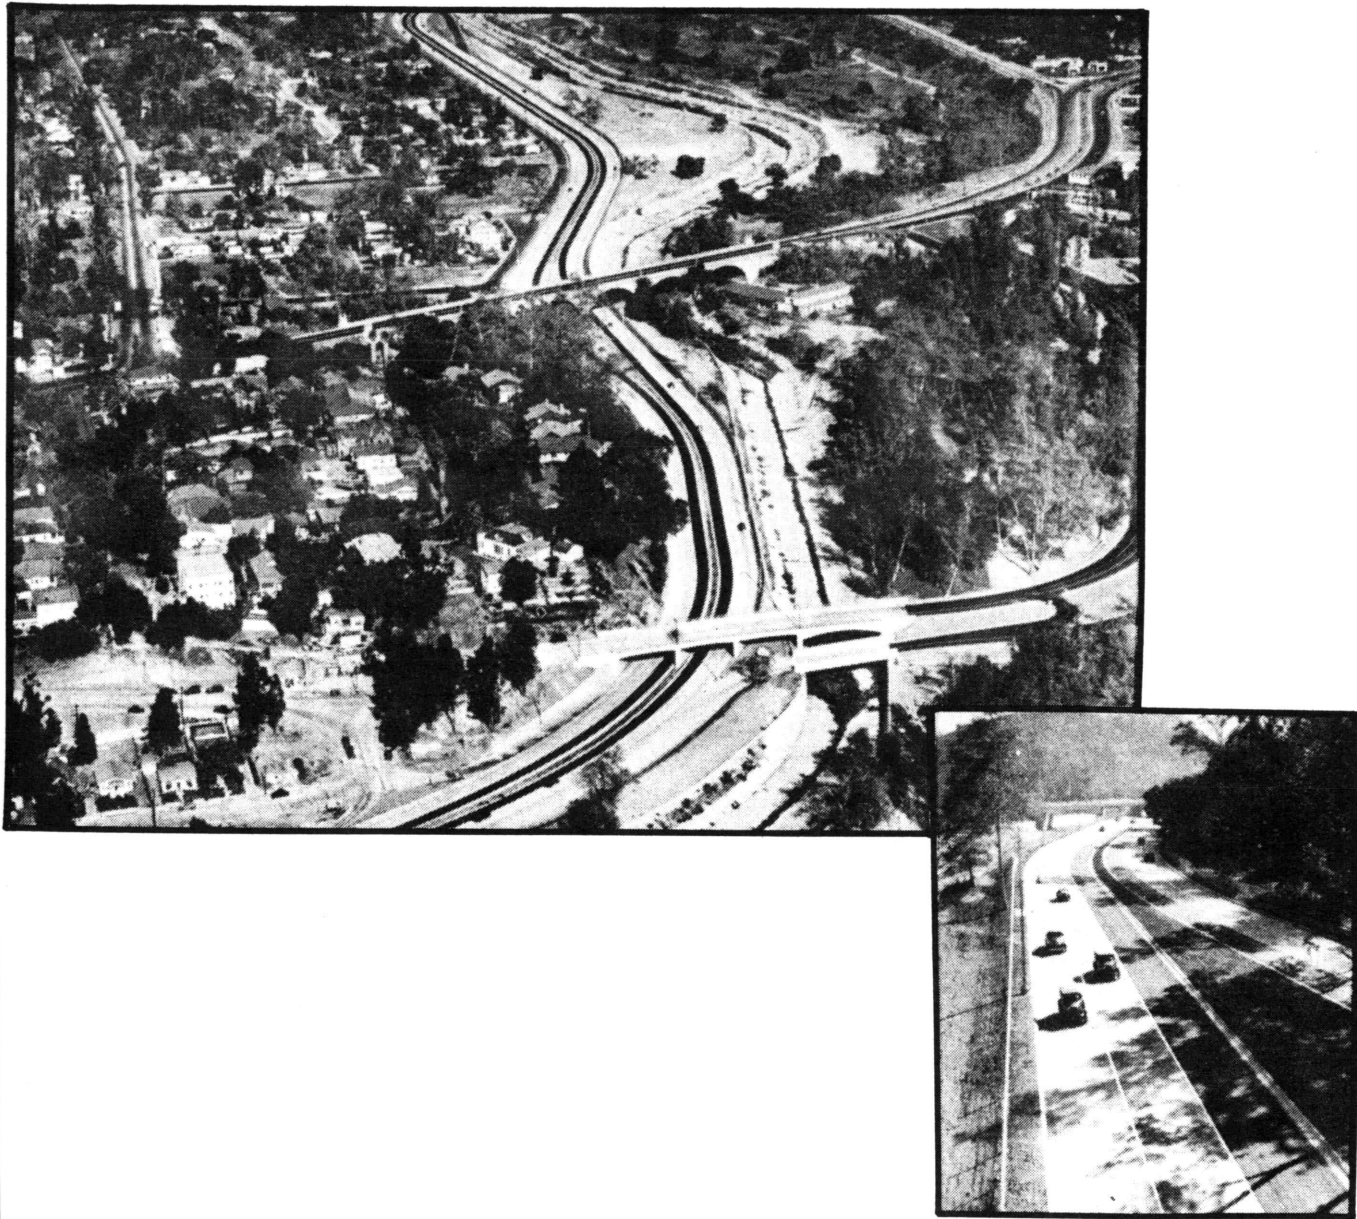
Arroyo Seco Parkway, Los Angeles.
